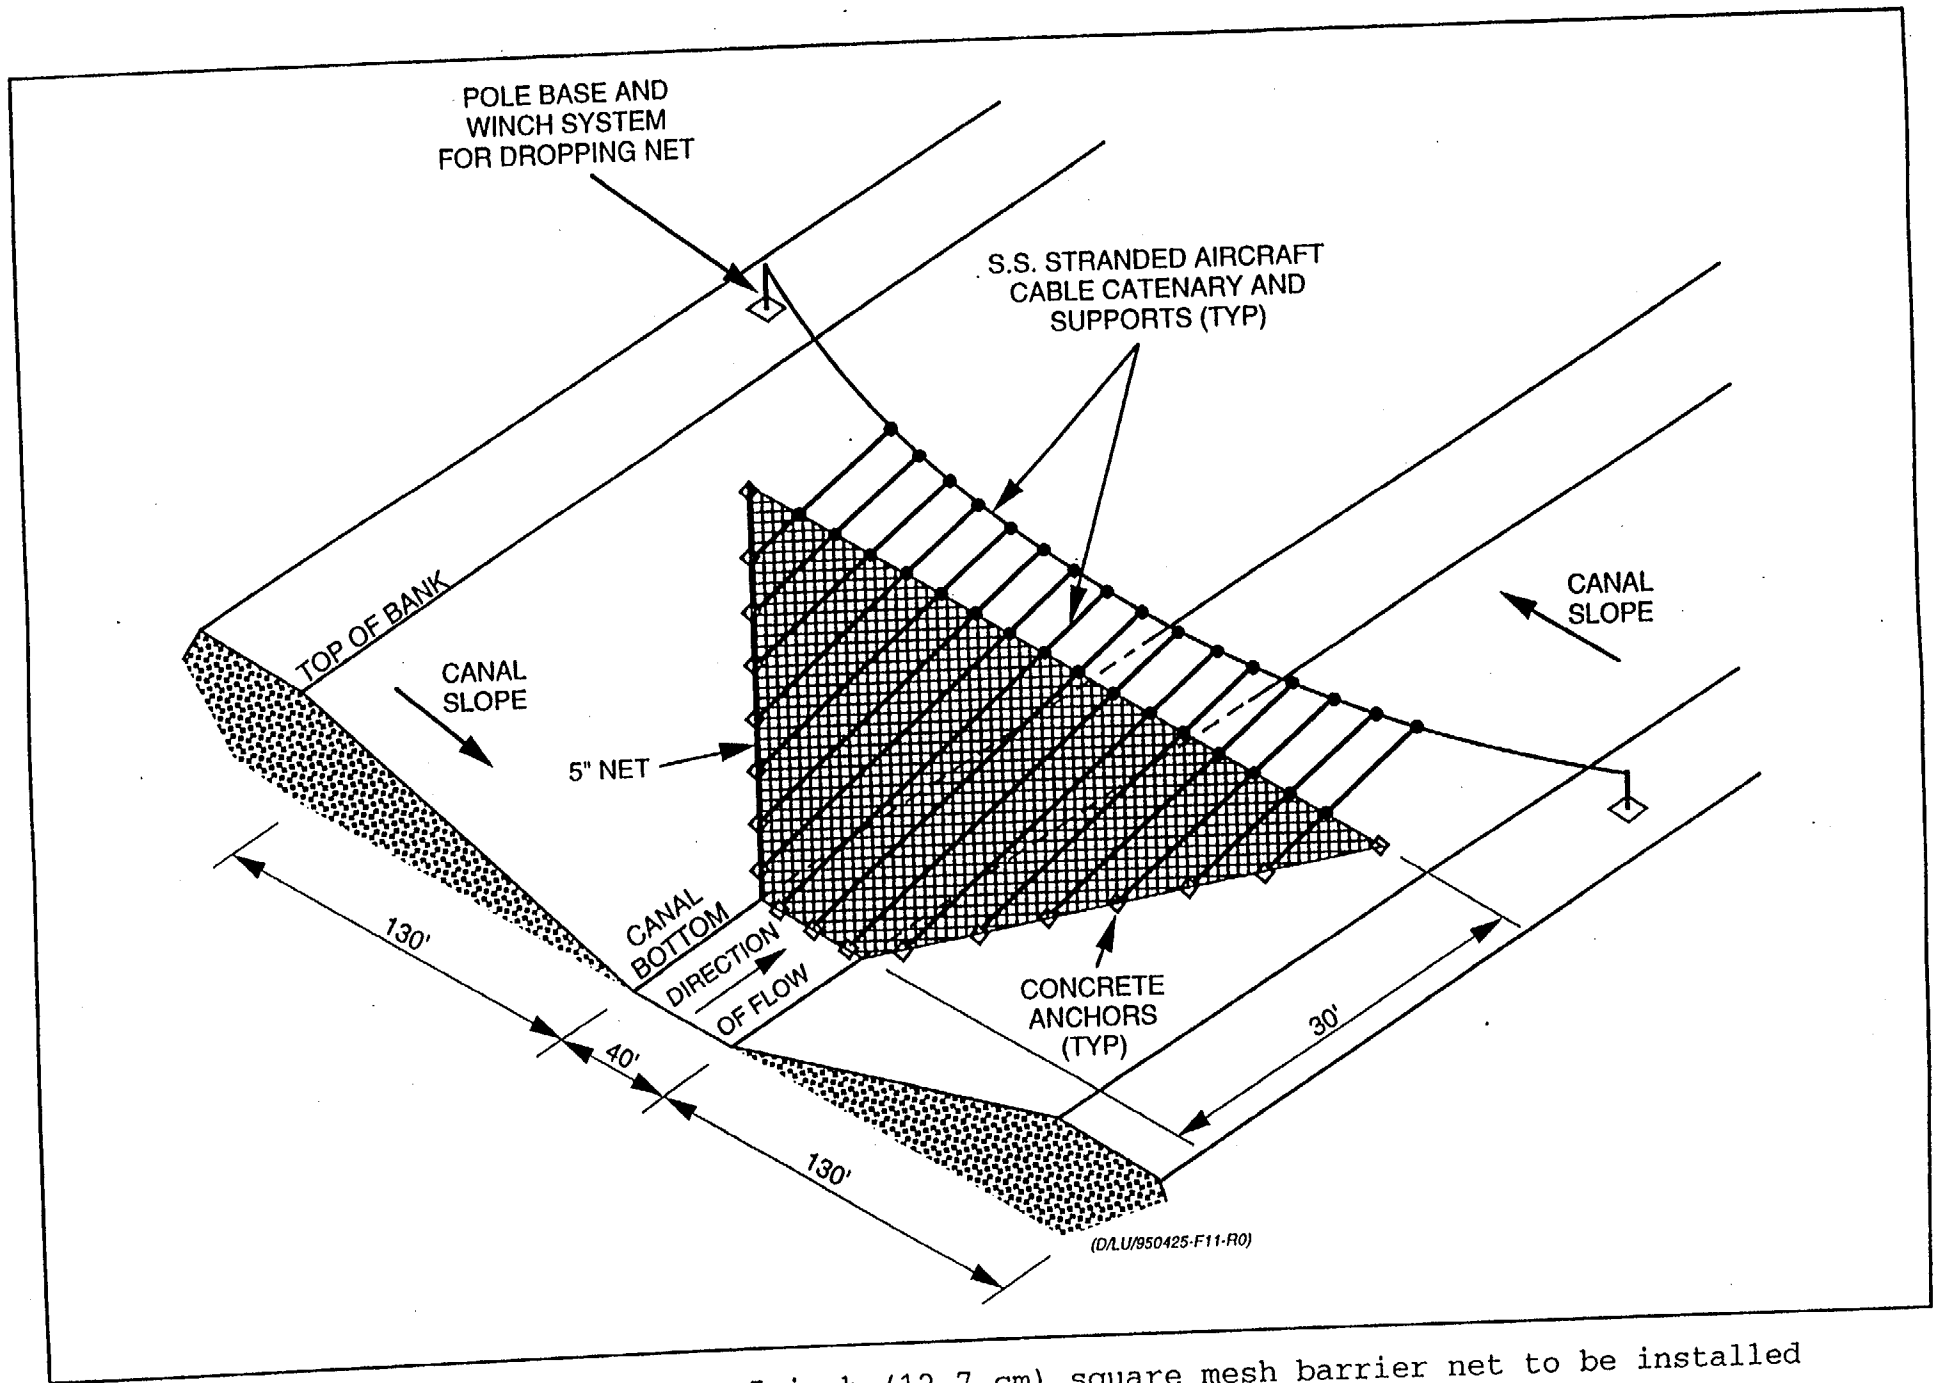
Conceptual design for a 5 inch (12.7 cm) square mesh barrier net to be installed in the intake canal of the St. Lucie Plant.
